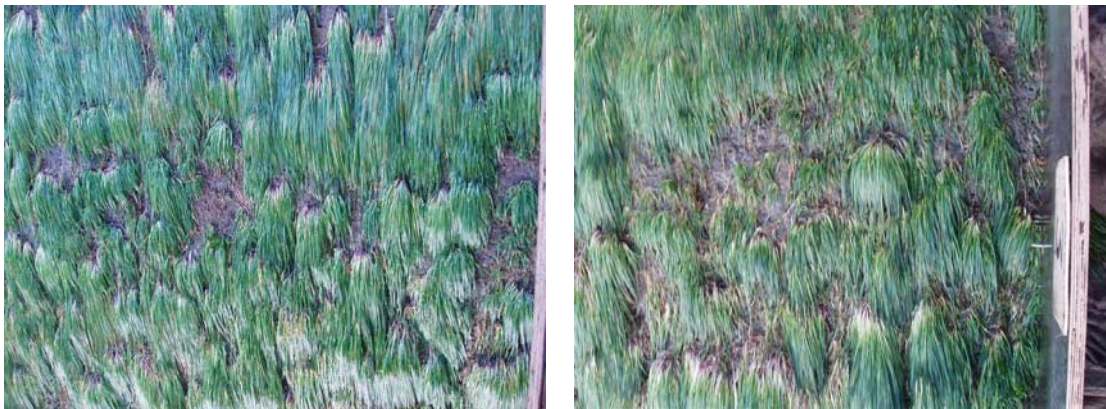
Detailed photographs of some bare spots after the 20 l/s/m test at the reinforced test section
